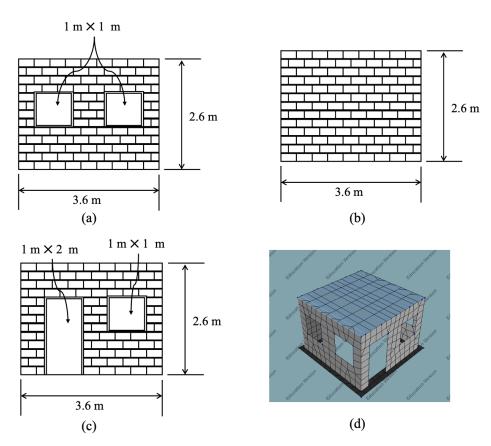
(a) North and South Elevation View of CHB-5 (b) West Elevation View of CHB-5 (c) East Elevation View of CHB-5 (d) DIANA Mesh of CHB-5
